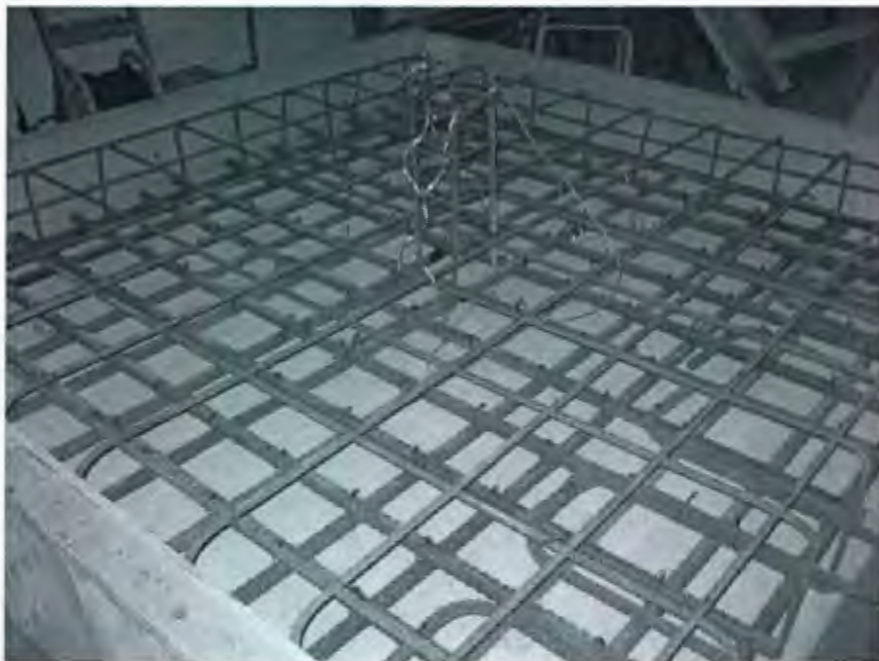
A reinforcement cage in the formwork for a typical slab (group B)
